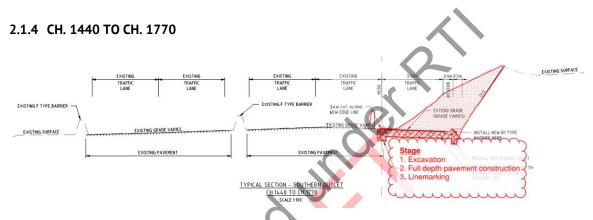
Typical section - Southern Outlet Ch. 1440 to Ch. 1770
